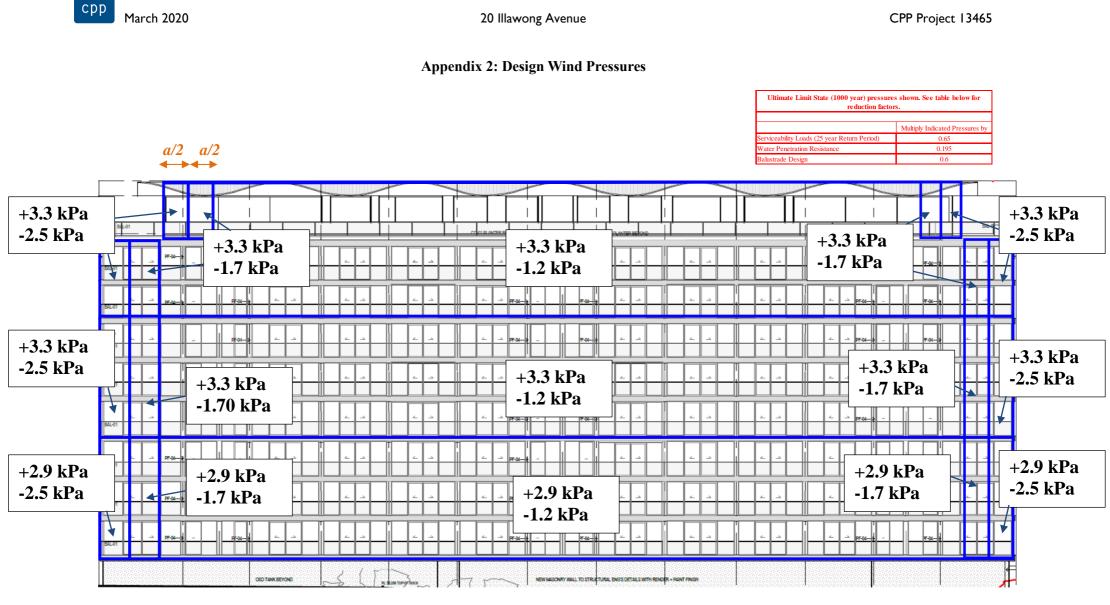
1000-year return period design pressures – East elevation. a = 4.4 m.
